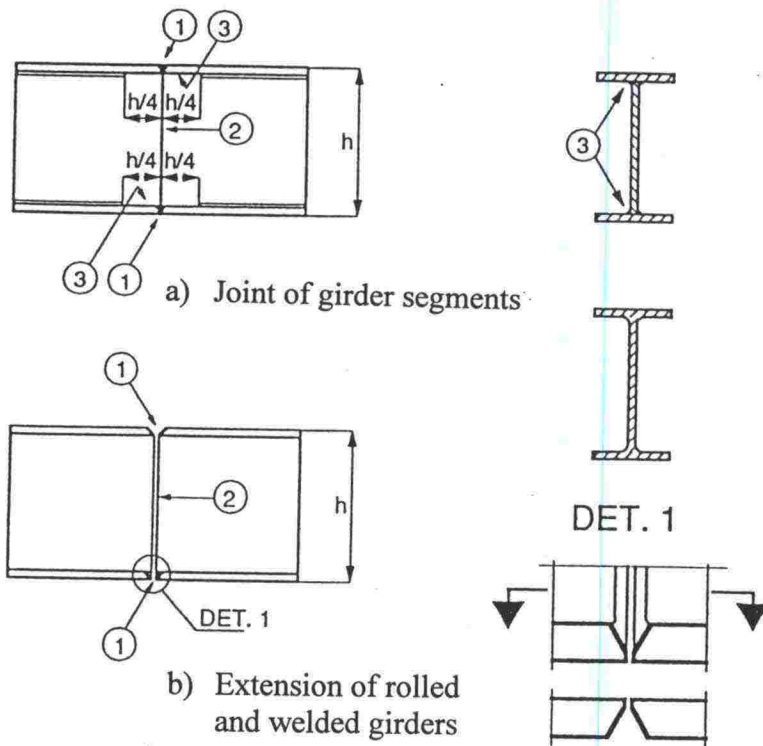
EXAMPLE OF ORDER OF WELDING
